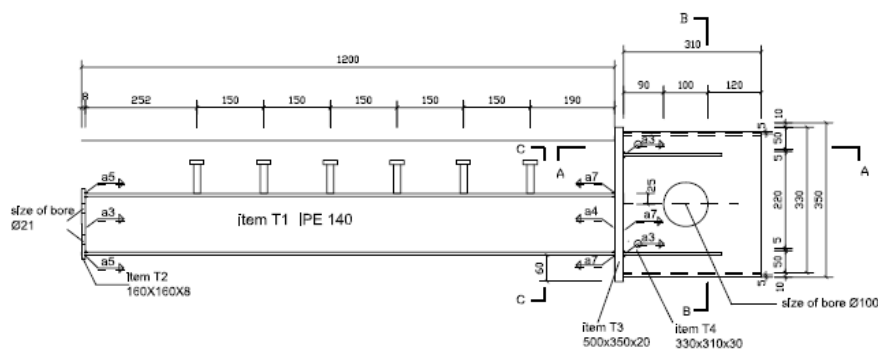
Steel beam IPE 140 with the arrangement of the shear studs
